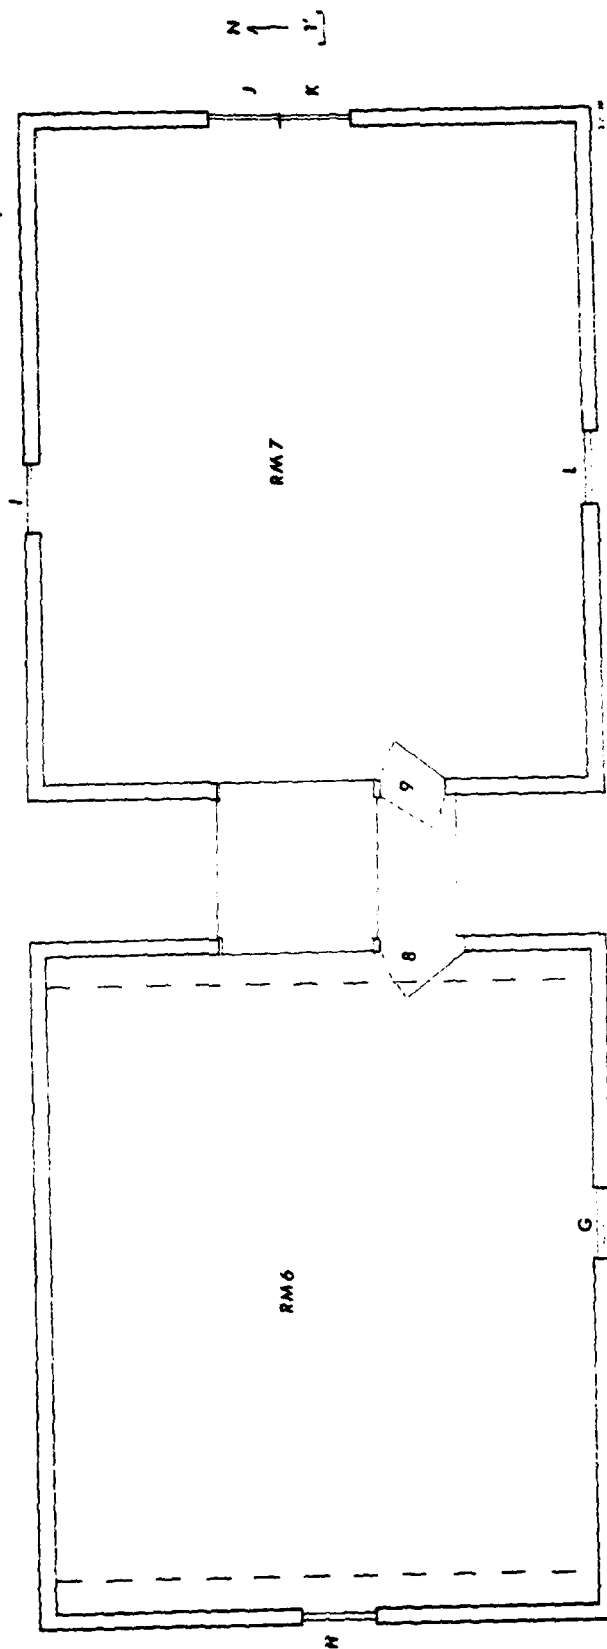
Floor plan of upper storey Horton/Kitchen home.
